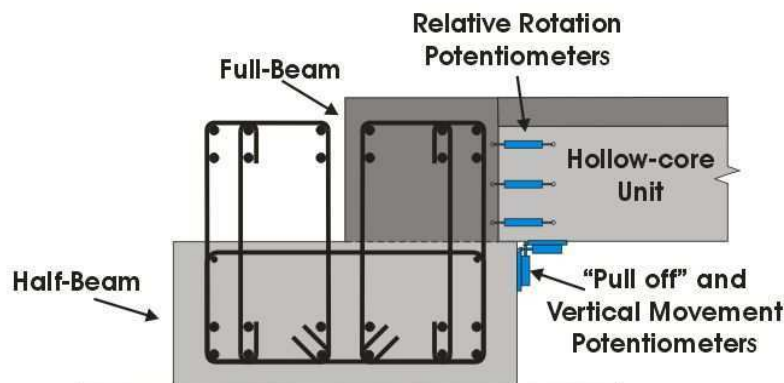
Seating beam to floor interface instrumentation (Adapted from Jensen 2006)
